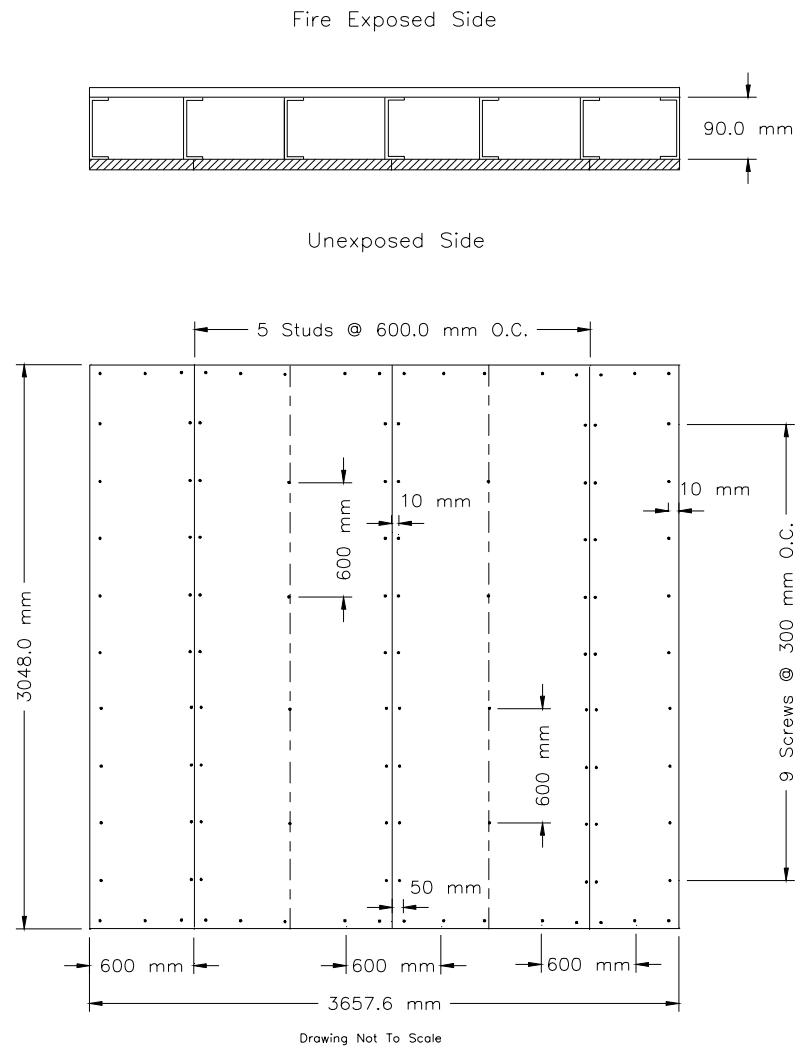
Screw Locations For Steel Stud, 1x1 Gypsum Board Layers, Full-Scale Assembly (Unexposed Side)
